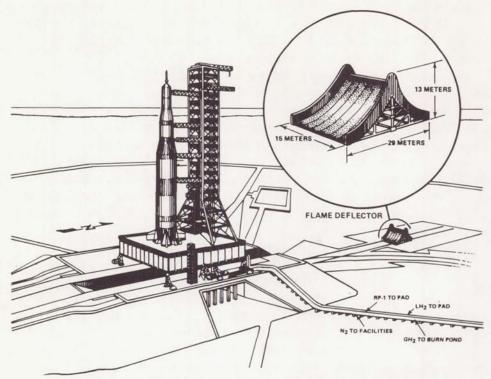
Sketch of LC-39 pad, with enlargement of the flame deflector, May 1963.
